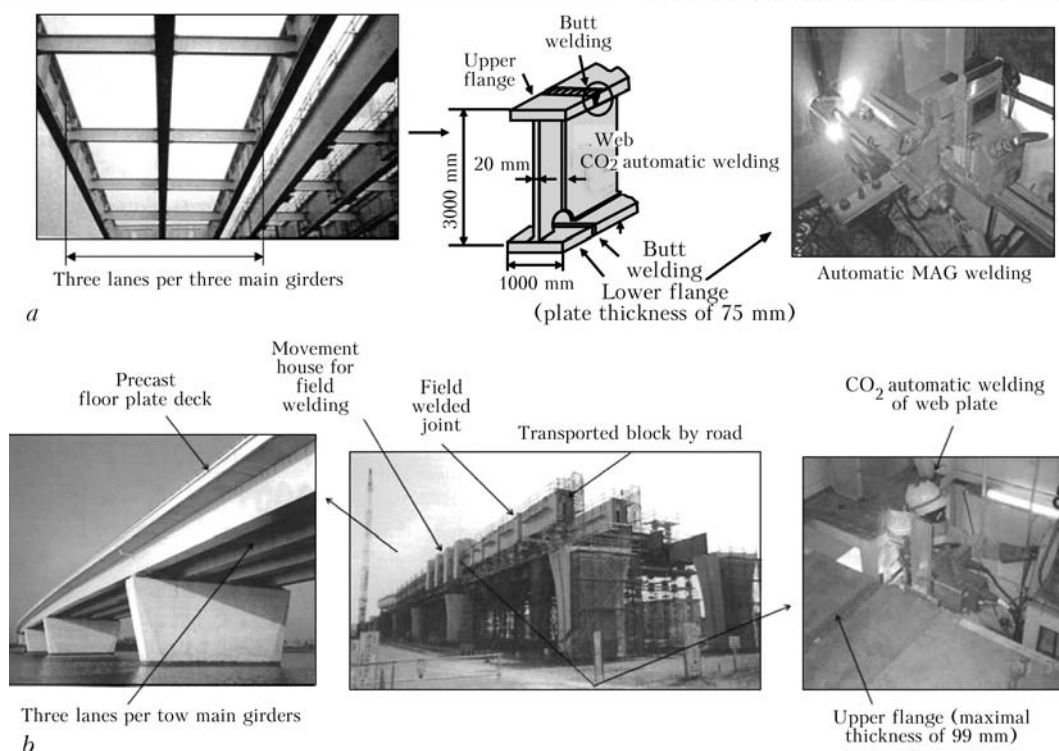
Structure of rational design concept bridge and field welding: *a* — plate girder bridge; *b* — box girder bridge
